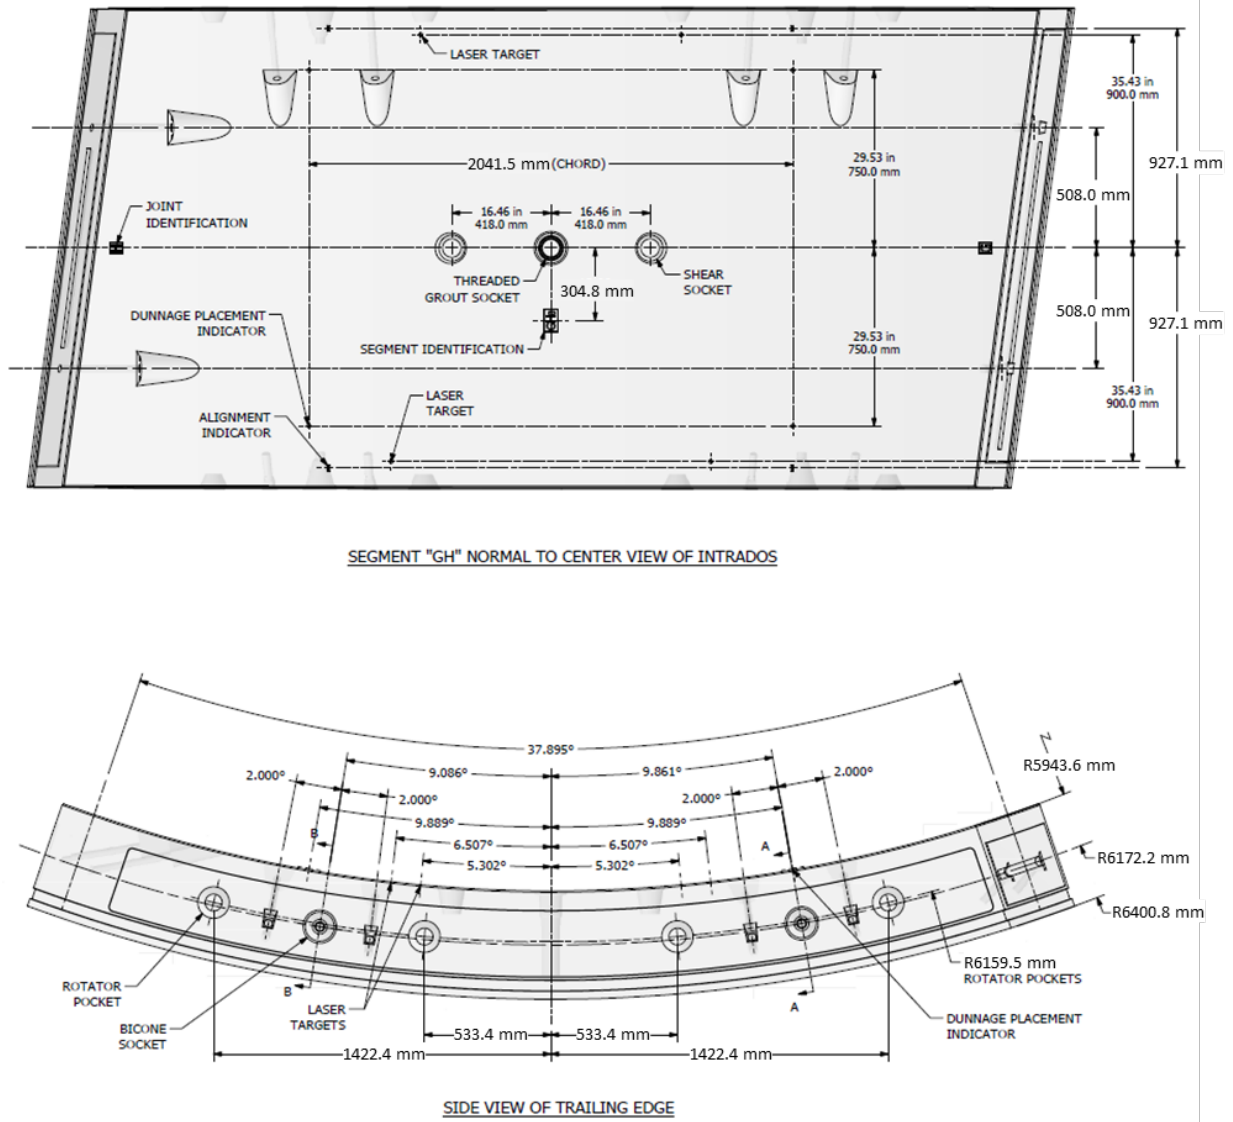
Geometry and dimensions of GH tunnel liner segment.
